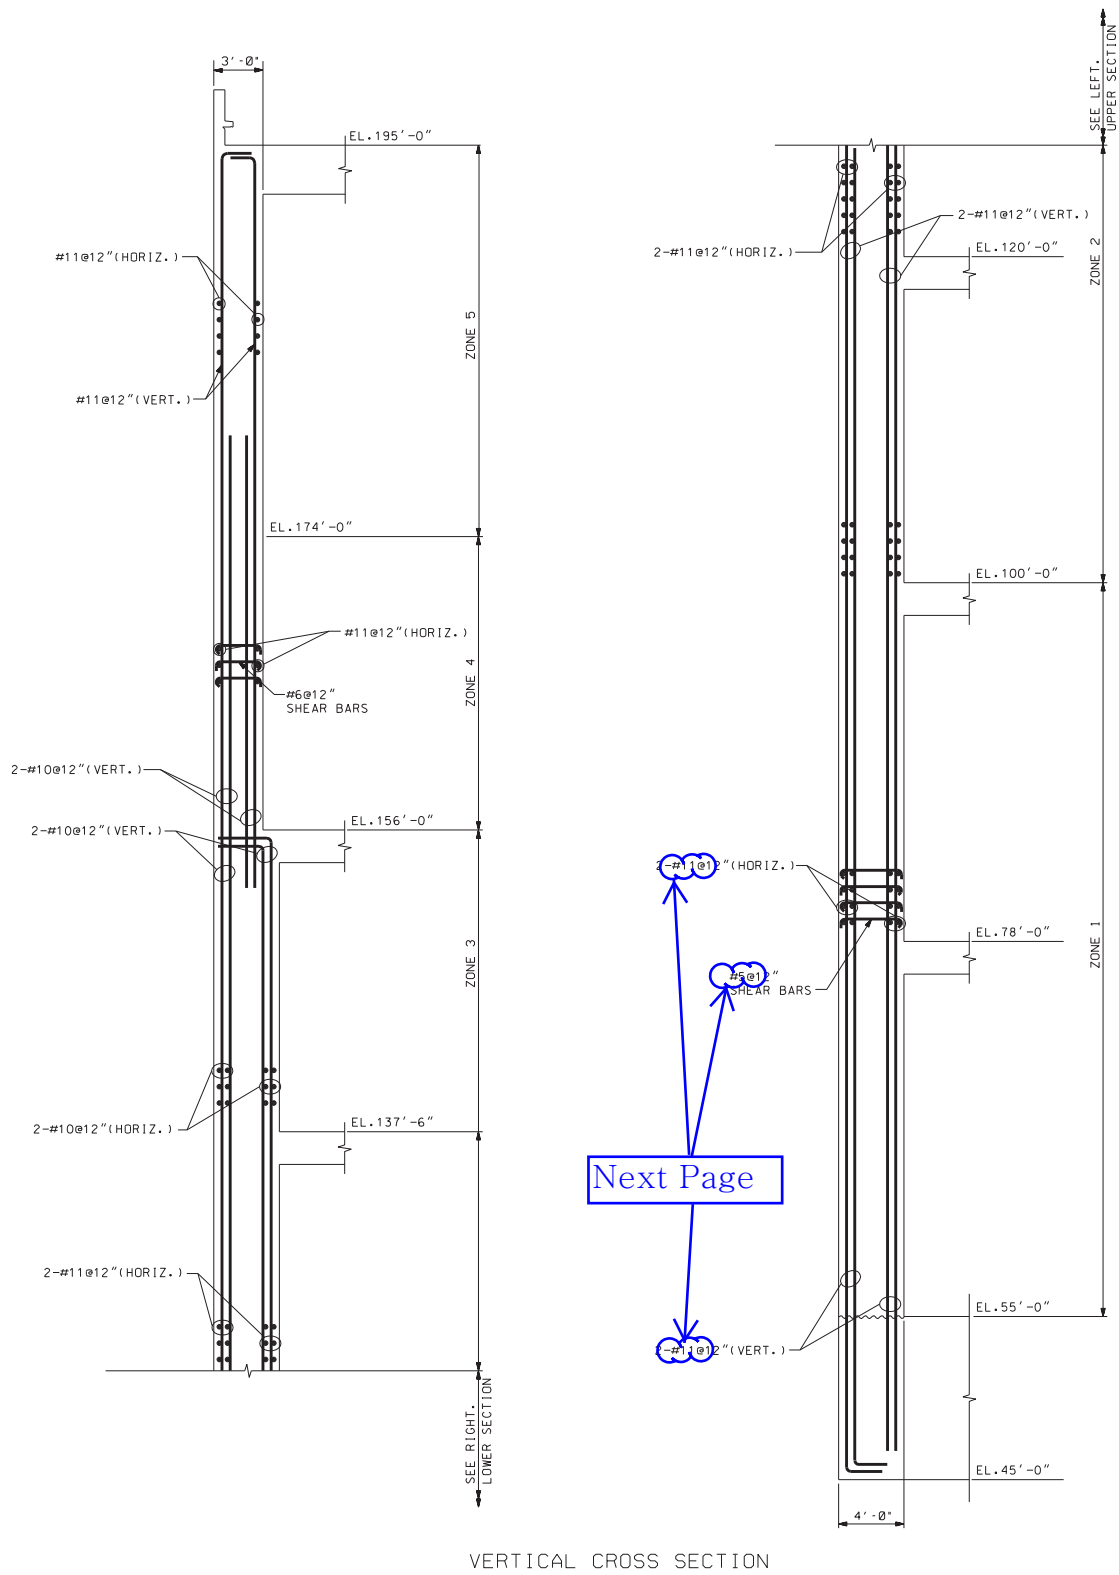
A-43 Reinforcement Arrangement of the AB MCR Wall (Section 1)
